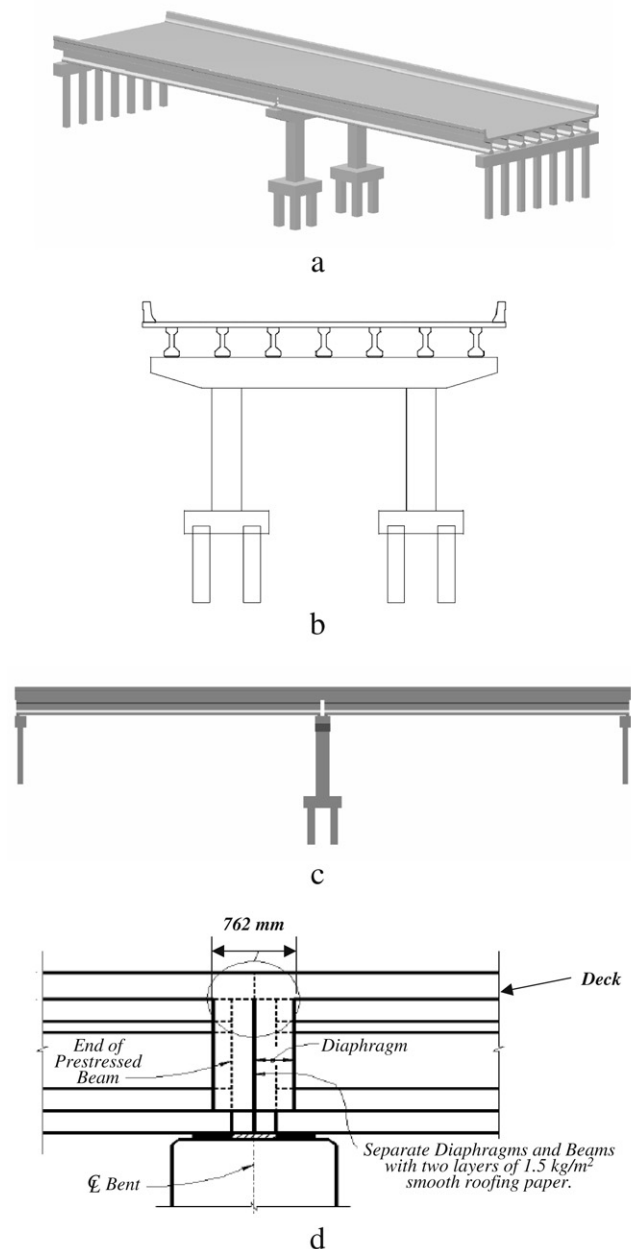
Model bridge — (a) perspective view, (b) cross-section, (c) elevation, and (d) section at interior support showing diaphragm (Courtesy: FDOT, modified).
